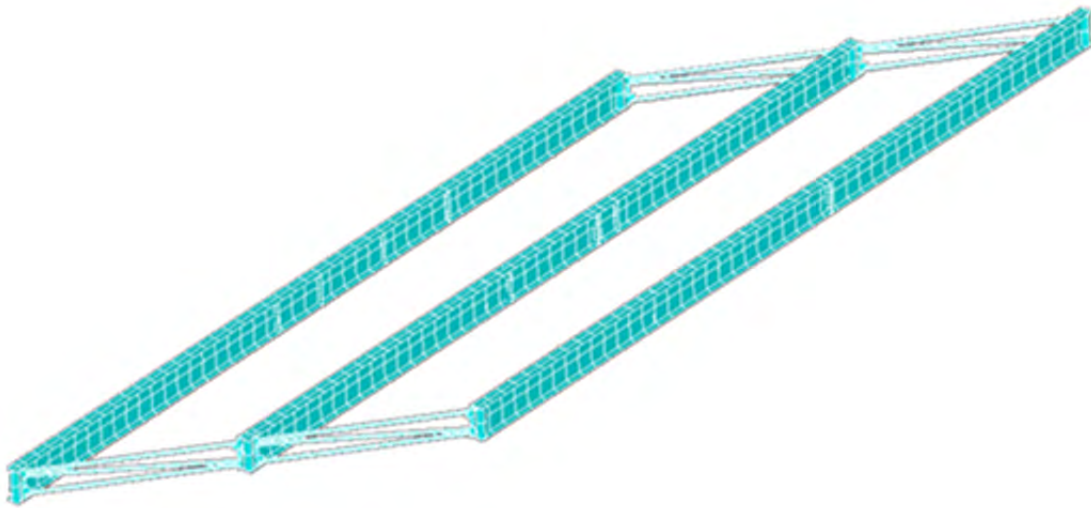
Three girder finite element model with split pipe-stiffener end cross-frames
